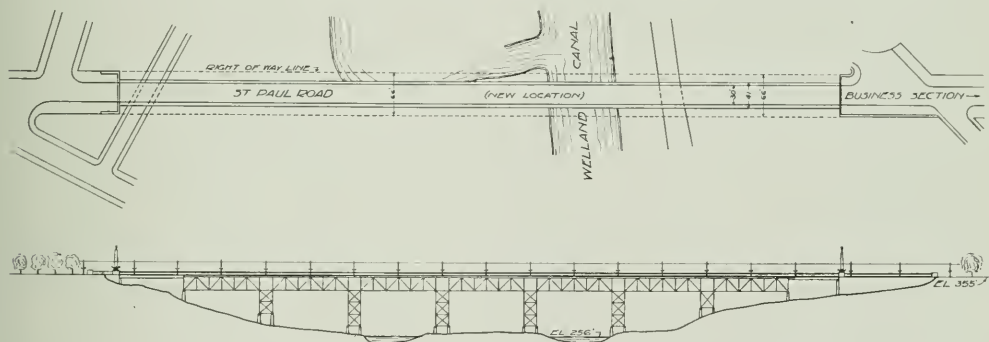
General Plan and Elevation of the Proposed Bridge.
